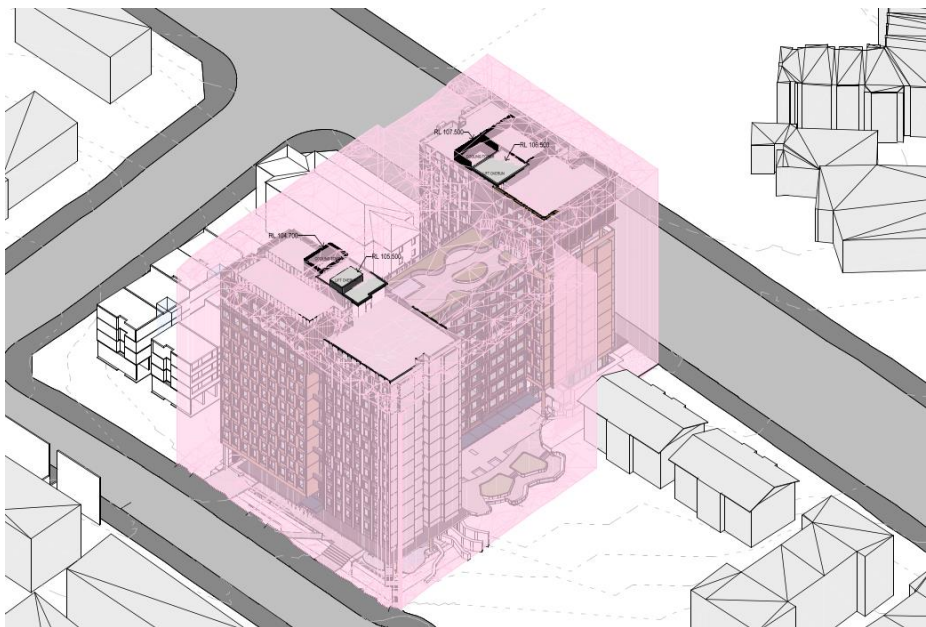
Permitted 45m height plane (in pink) as viewed from the north-east (Lachlan Avenue).
